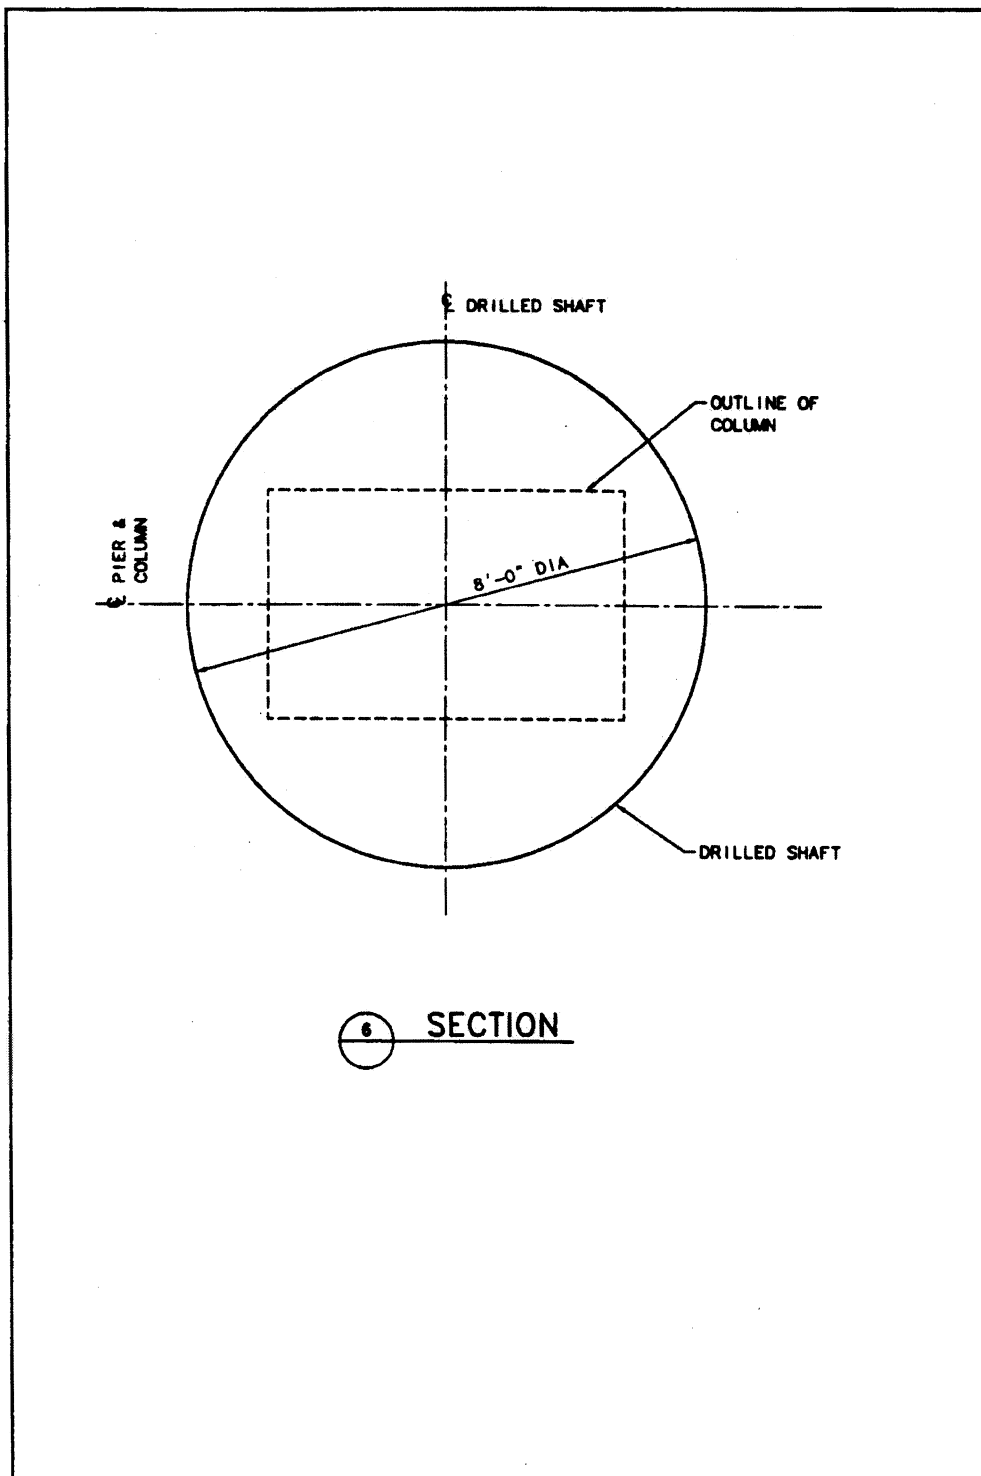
Bridge No. 6 – Horizontal Section Through Drilled Shaft
